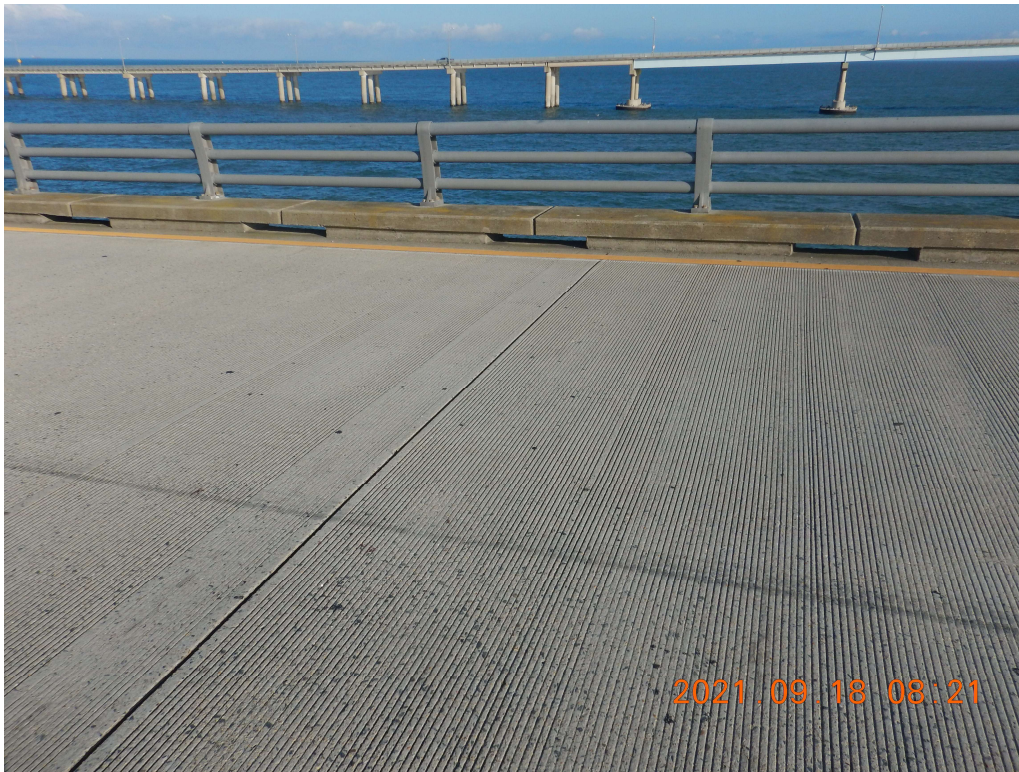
NCB-NB Deck and Railing- Typical Condition of Deck and Railing over Pier 2
